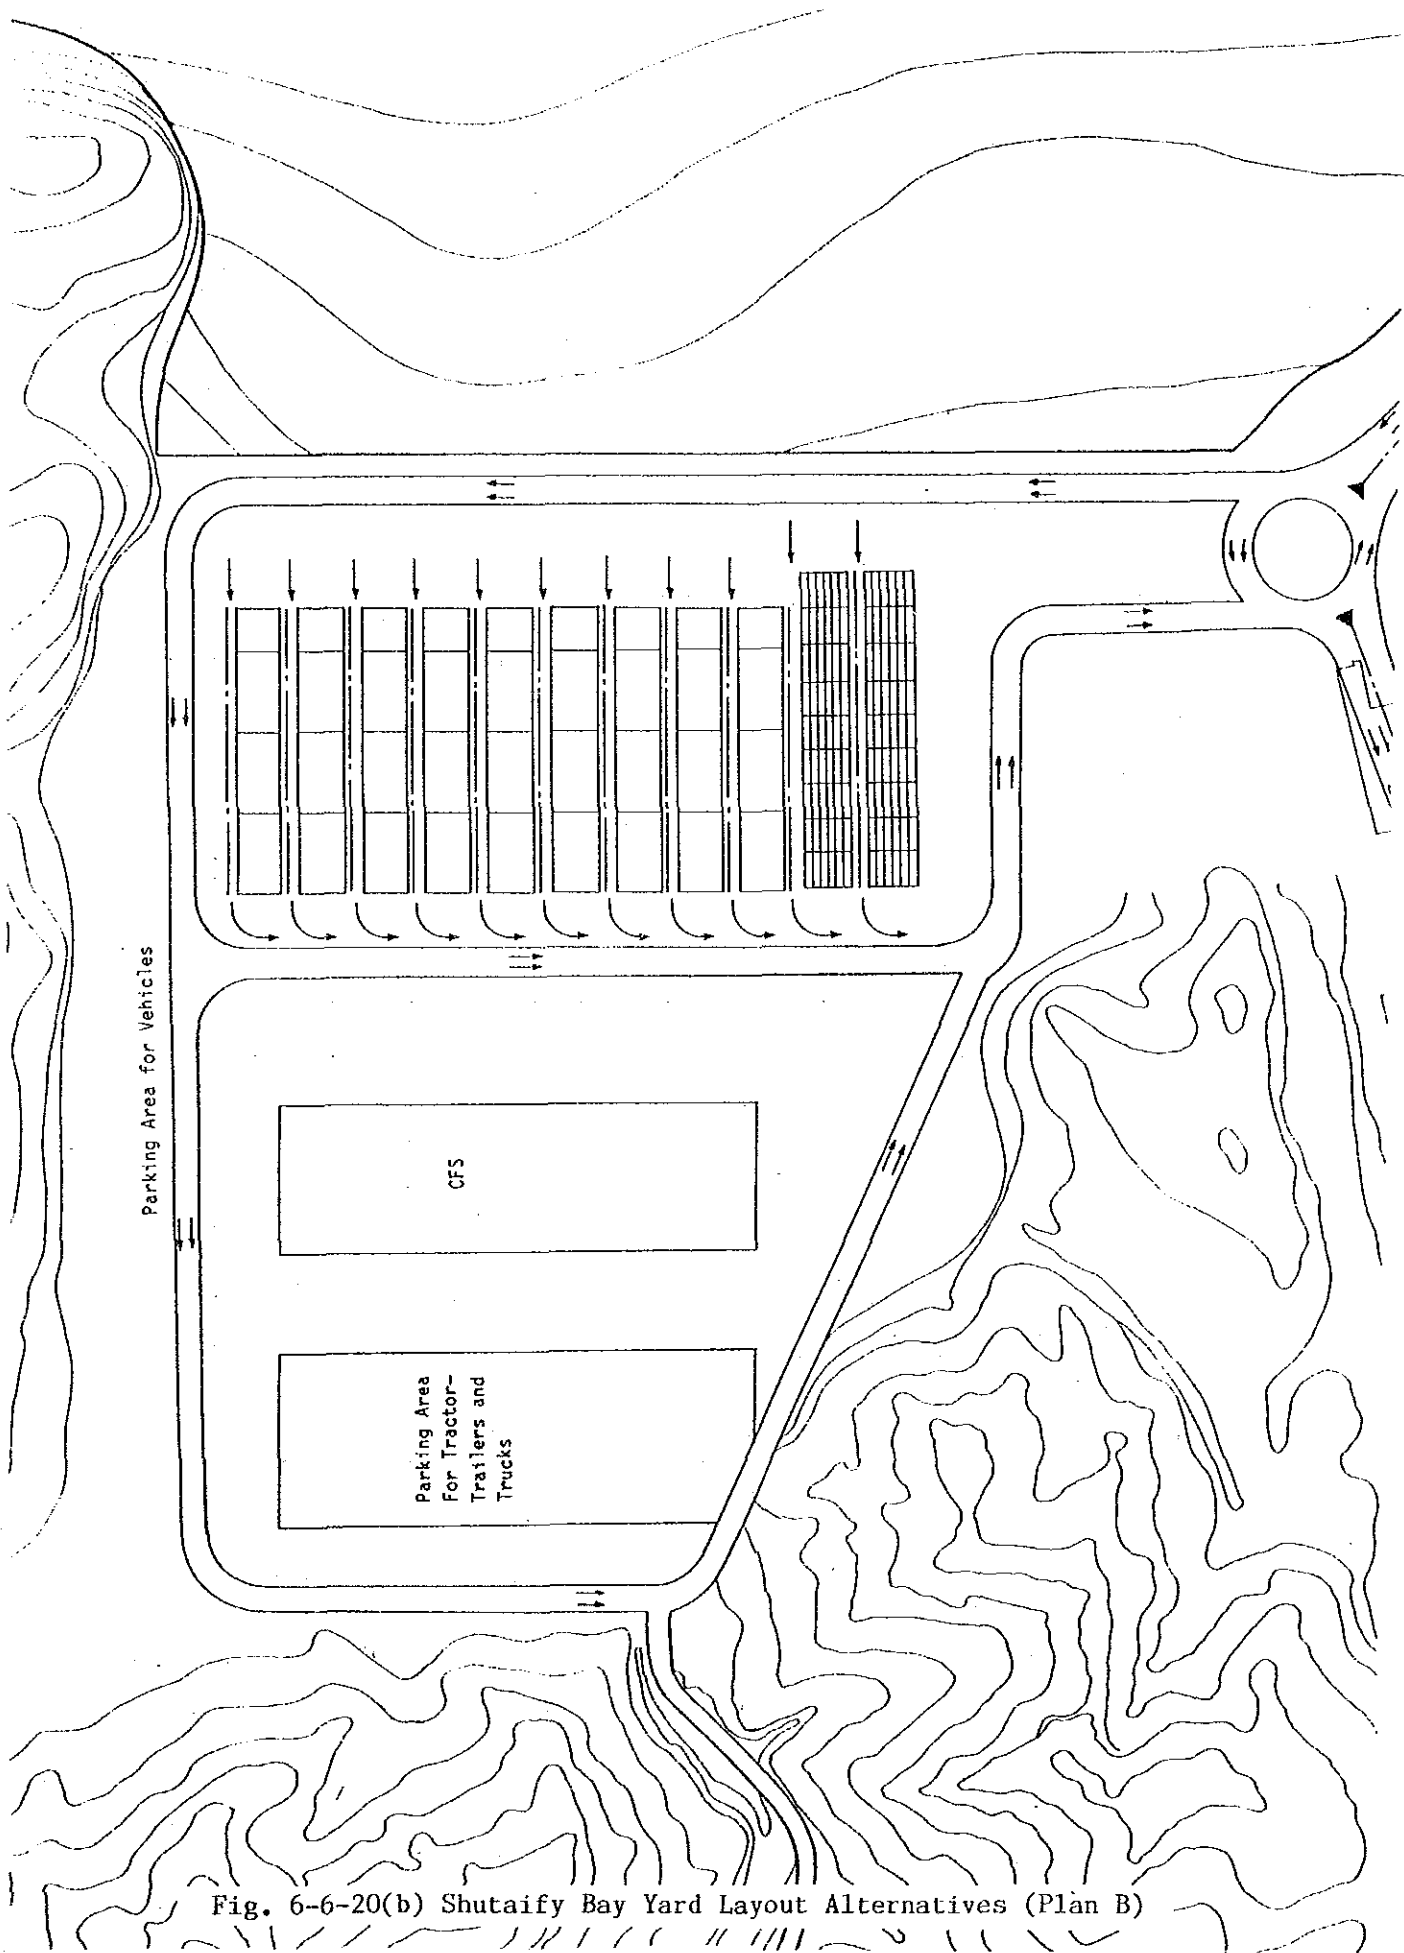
(b) Shutaify Bay Yard Layout Alternatives (Plan B)
